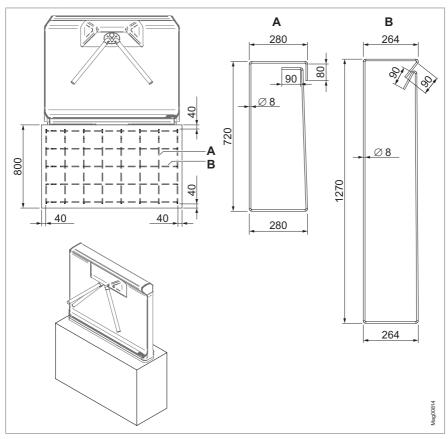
Reinforcement plan FMTP-ML (dimensions in mm)
